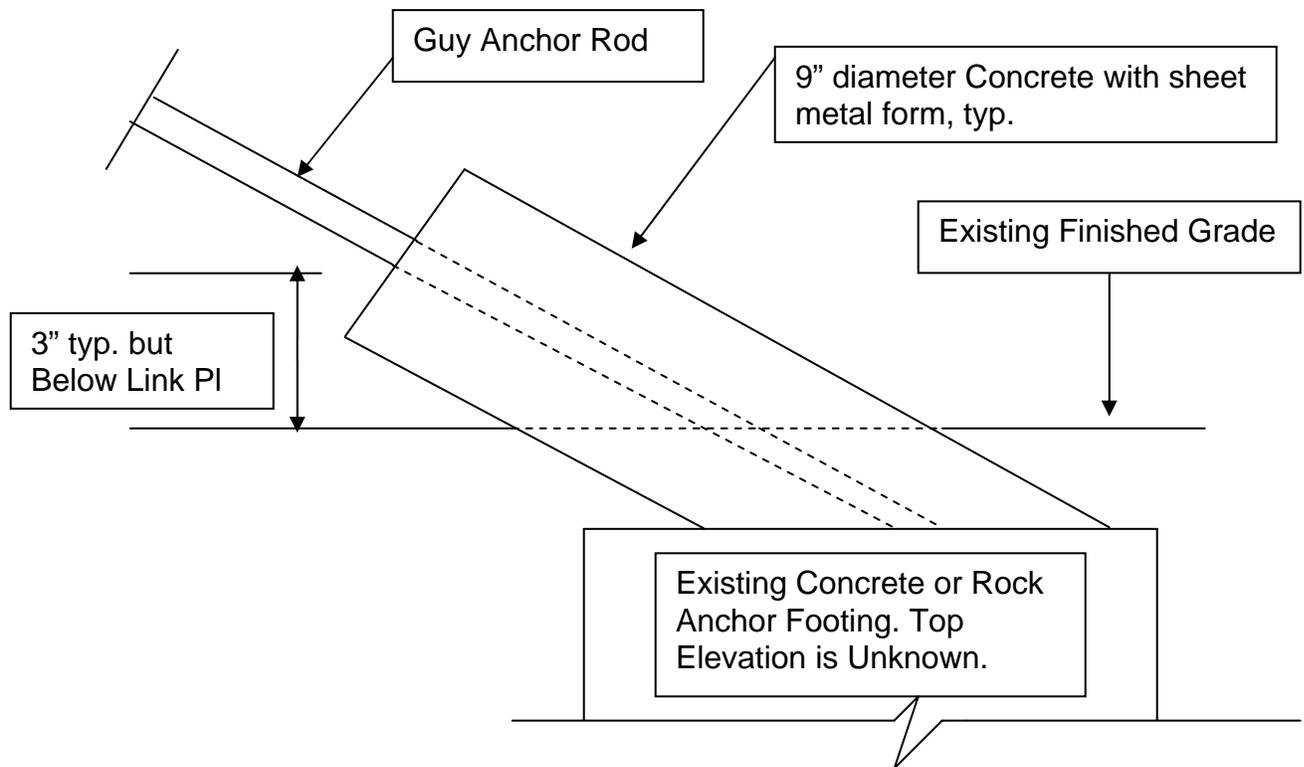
, Typical Concrete Encasement of Guy Anchor Rod for Antenna Tower A and B, Saipan Site
